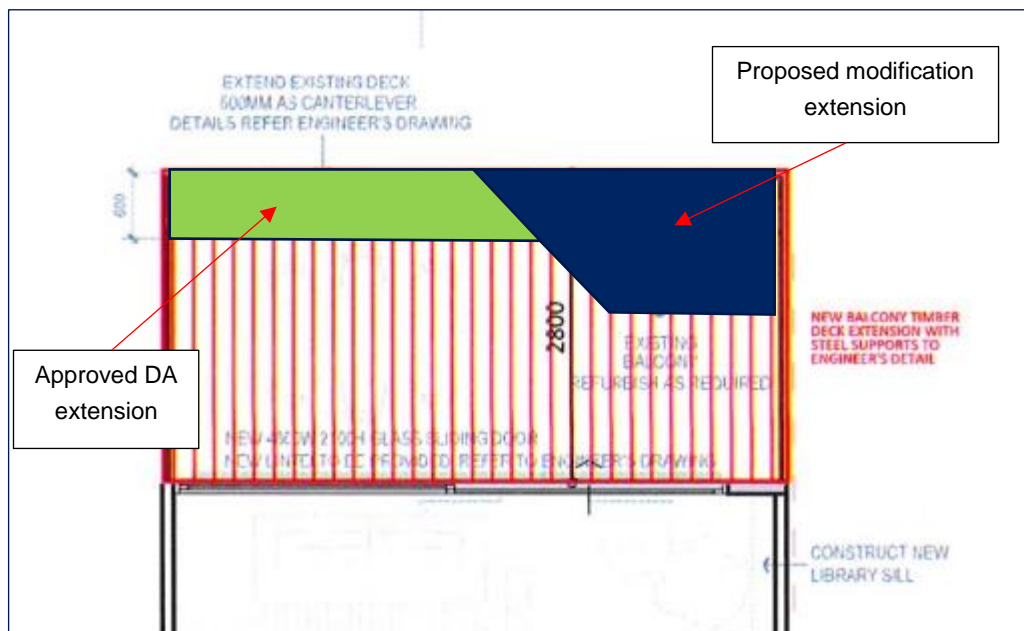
| Proposed deck alterations (Source: Applicant’s documentation)
